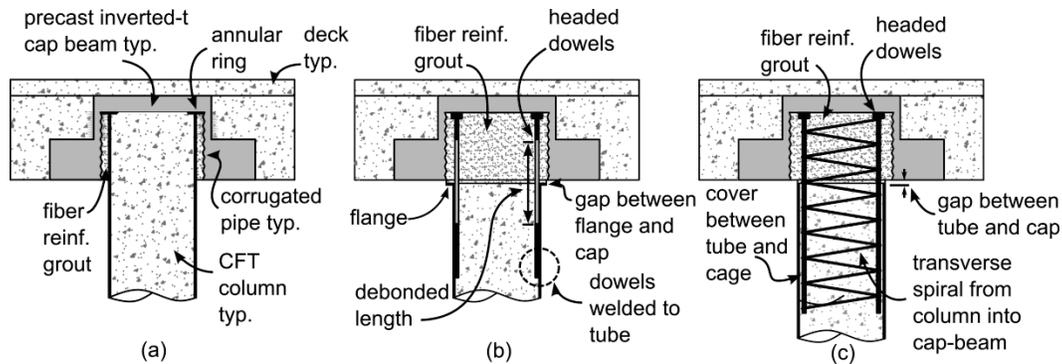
Proposed CFT Column-to-Precast Cap Beam Connections. (a) Embedded Ring Connection (ER), (b) Welded Dowel Connection (WD), and (c) Reinforced Concrete Connection (RC)
